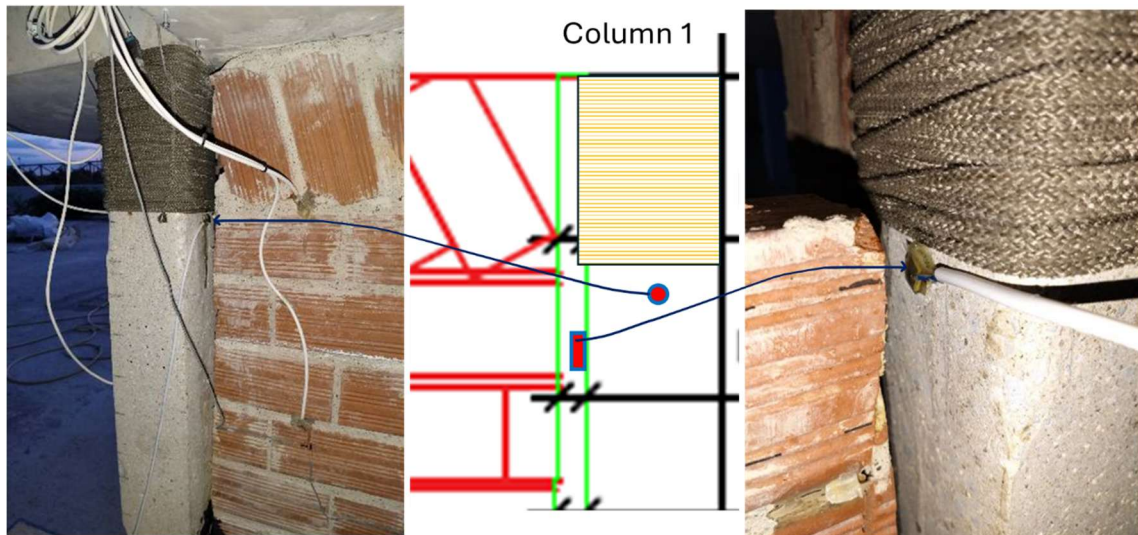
Details of the PZT patches installed at the surface of RC column.
